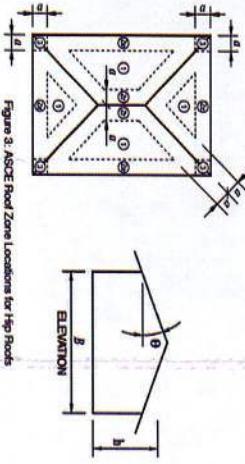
ASCE Roof Zone Locations for Hip Roofs
